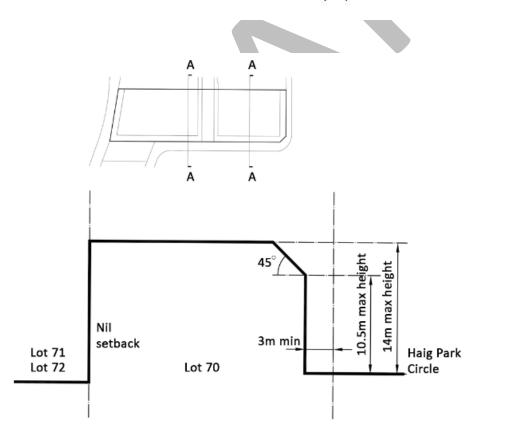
Section AA - North south section of building envelopes through eastern and western buildings.
